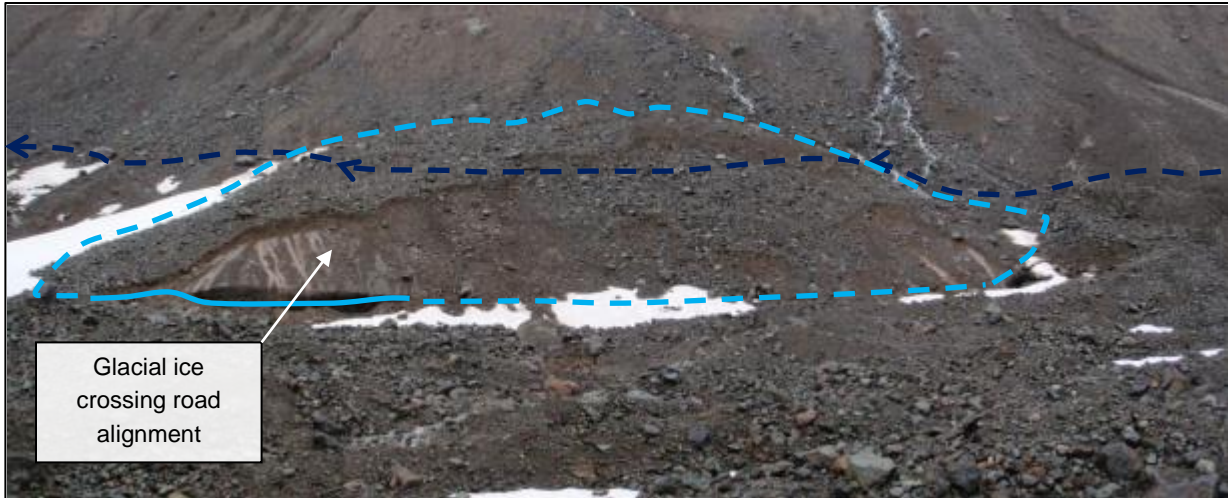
Tunnel Adit and Tunnel Adit Spur Access Roads – Looking downchain (southwest) from Treaty Creek access road towards the Tunnel Adit and Tunnel Adit Spur access roads.
